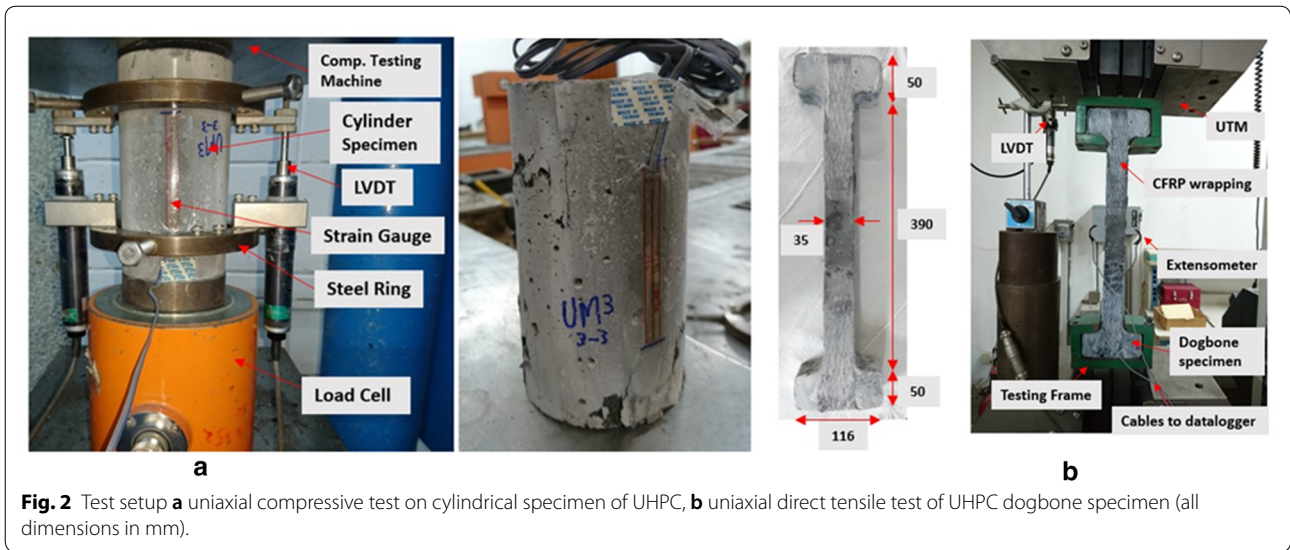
Test setup a uniaxial compressive test on cylindrical specimen of UHPC, b uniaxial direct tensile test of UHPC dogbone specimen (all dimensions in mm).
